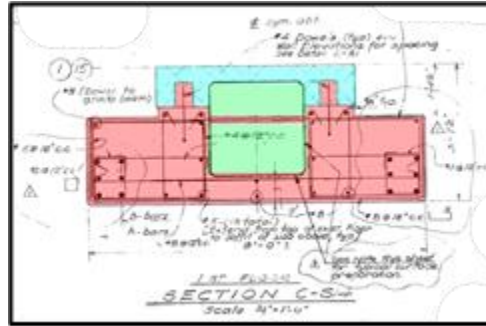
The 1971 retrofit resulted in the conversion of the reinforced concrete perimeter columns (green highlight) into heavily reinforced piers (red highlight) of the perimeter shear walls. These piers along with the original reinforced concrete perimeter beams form a very robust perimeter shear walls. The exterior brick masonry (blue highlight) is reliably anchored to the pier.
